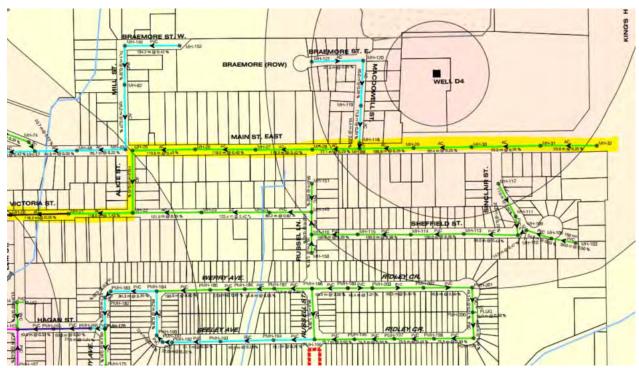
Dundalk Sanitary Collection System (Township of Southgate)
